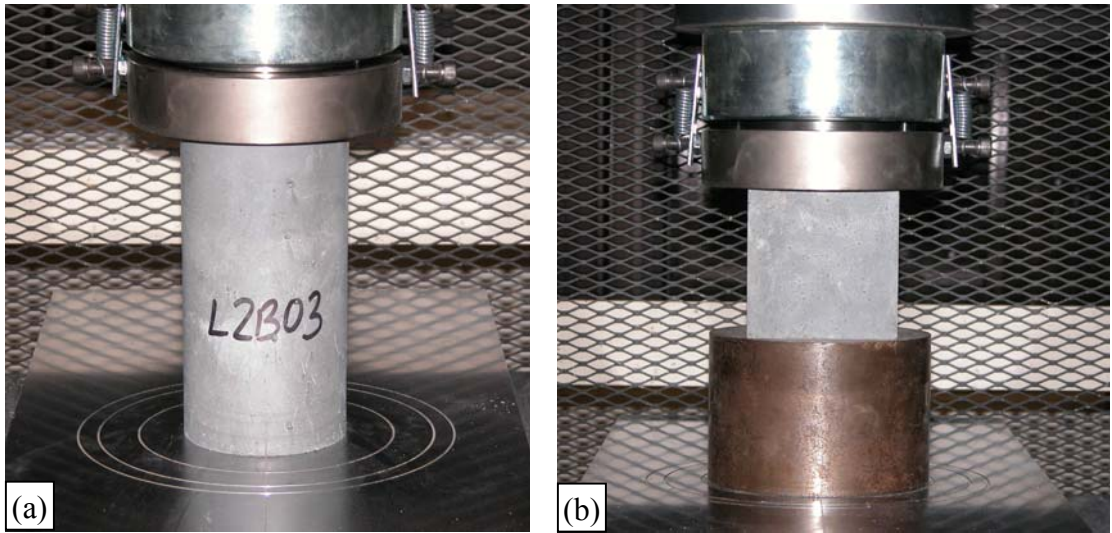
B: (a) Cylinder and (b) cube compression testing
